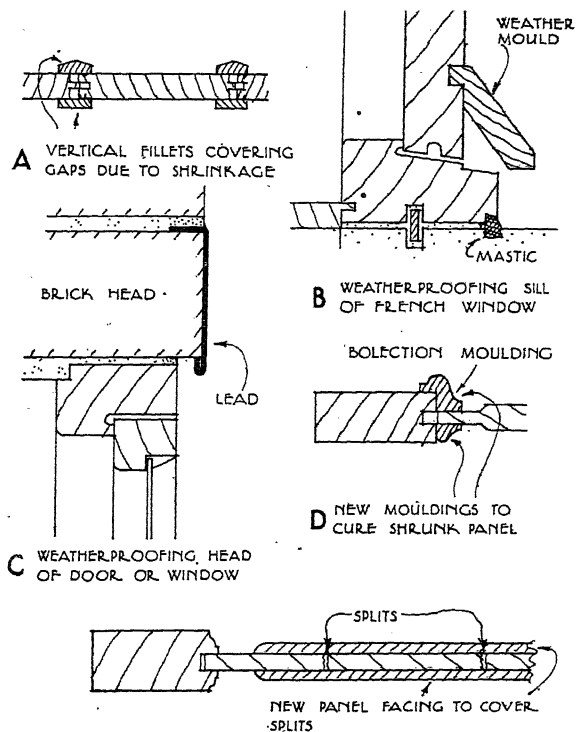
REPAIRS TO DOORS AND WINDOWS
